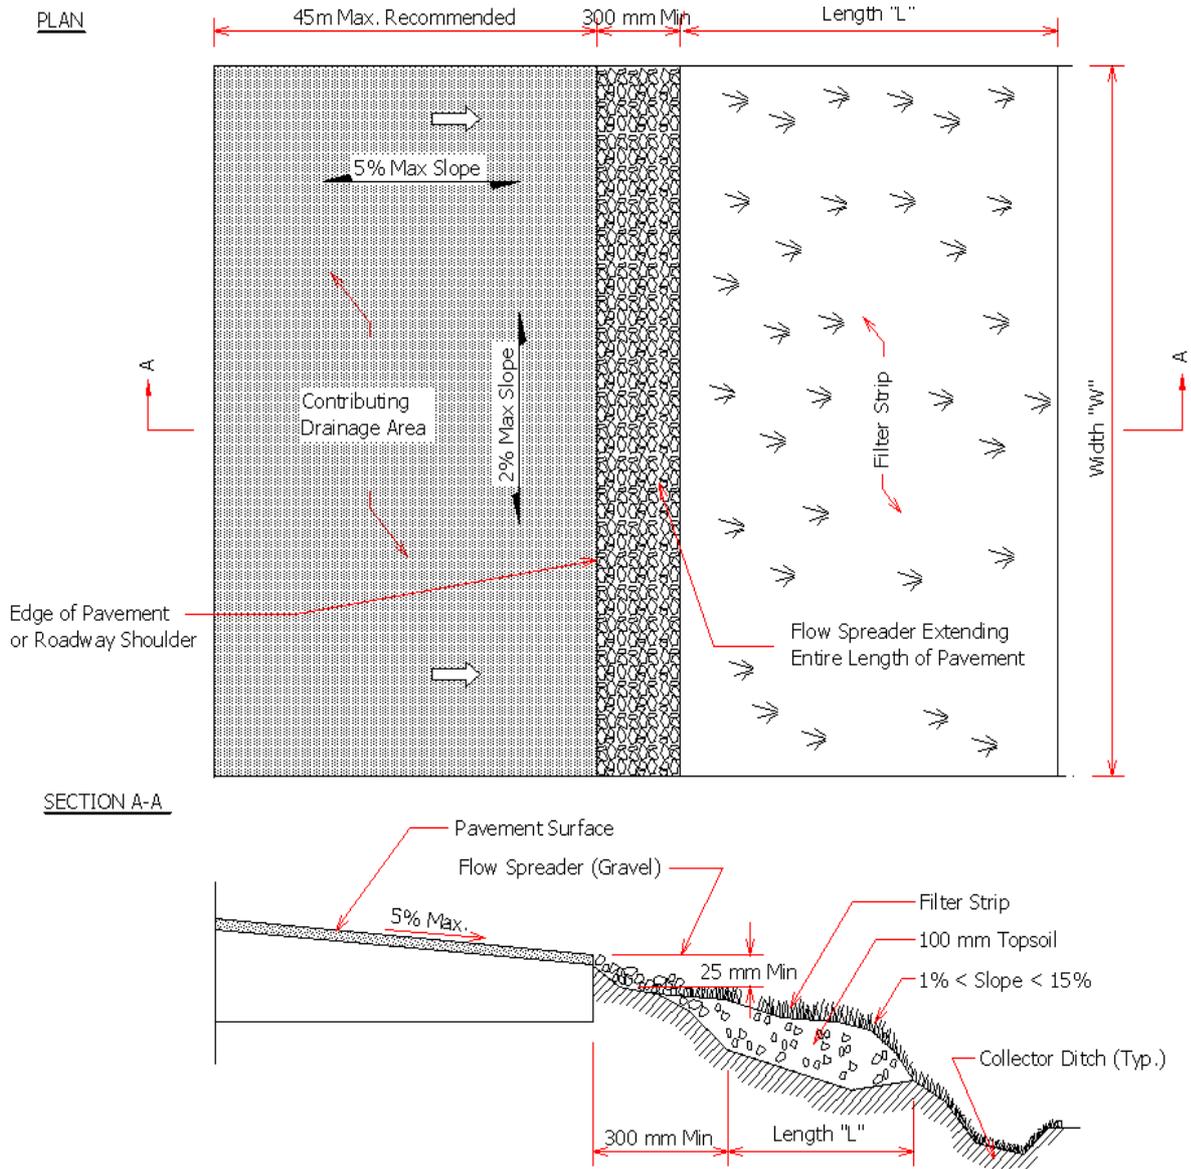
Plan and Cross Section of Typical Vegetated Filter Strip
